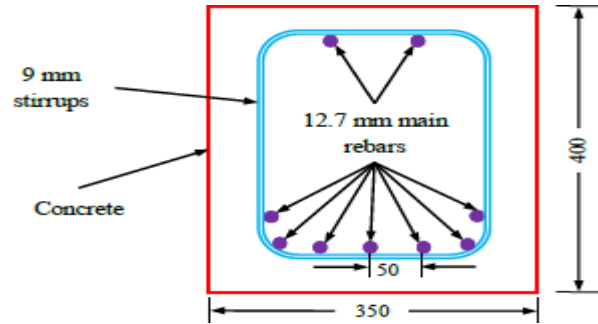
Arrangement of GFRP Rebars in Concrete Beam (All Dimensions are in mm)
